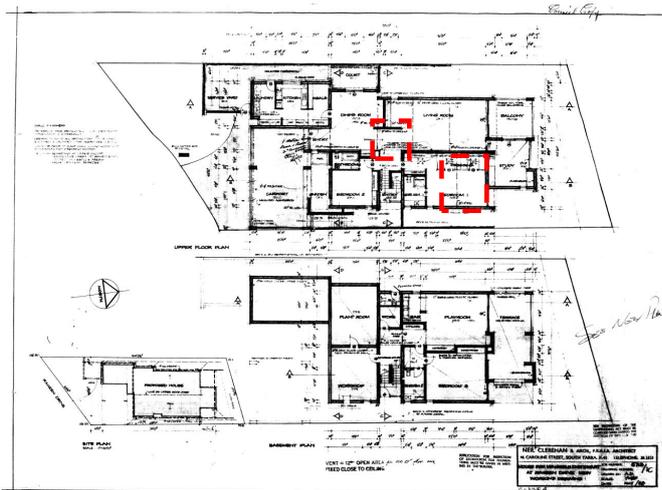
Site and Floor Plans of the subject site. Note the two entrances to the residence highlighted in red. Dated May 1968. (Source: Building Permit 778, for 13 Raheen Drive, City of Boroondara).
